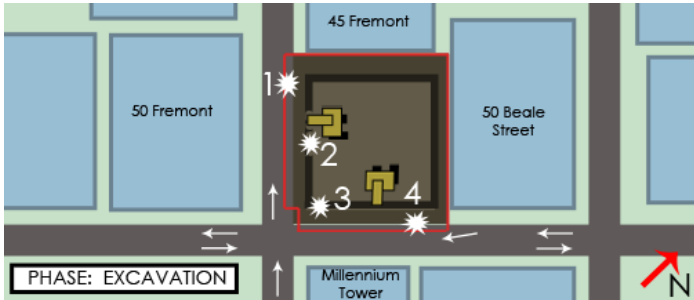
Shoring became a major concern in the construction process. Based on recommendations present in Treadwell & Rollo’s geotechnical report, the team decided to utilize a soil-cement-mixed wall system in shoring the excavated site.
